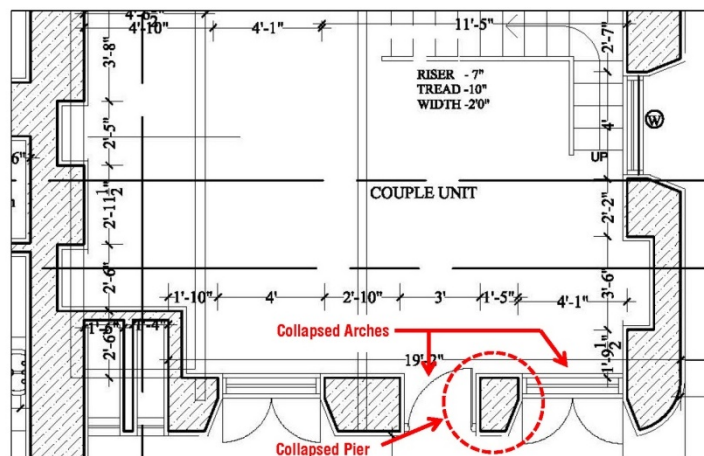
Close-up of Building I showing the pier where the collapse occurred.
